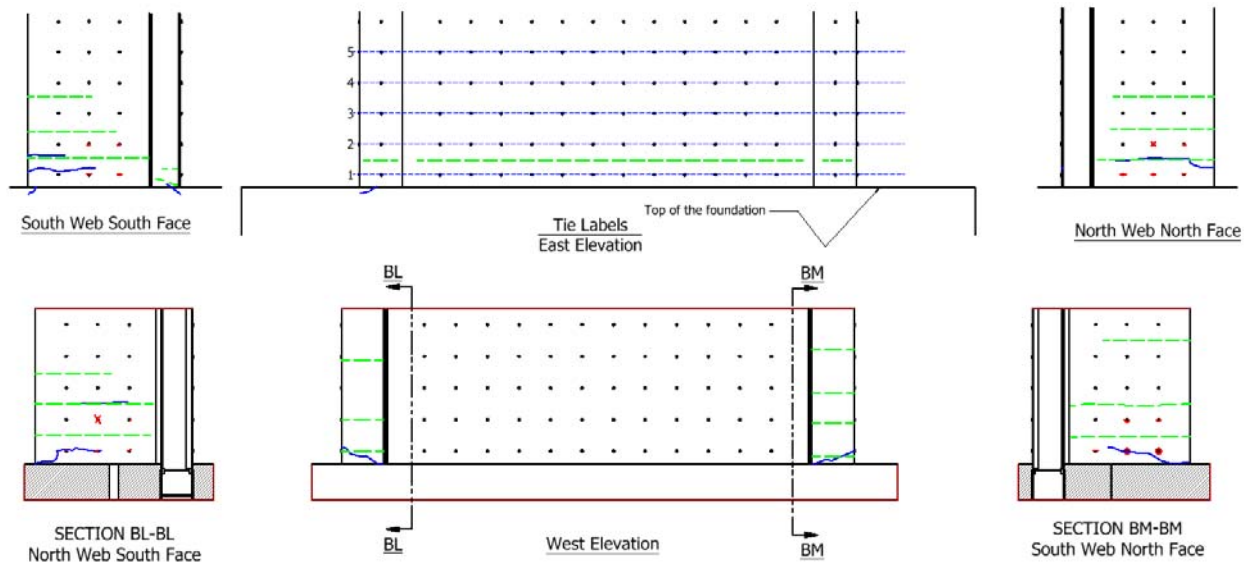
Post-test damage inspection of the wall steel plates for Specimen C2
